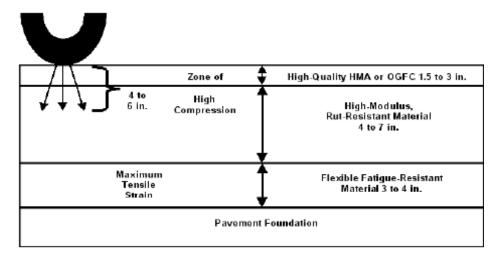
A-1: Perpetual Pavement Design – Typical Cross Section
